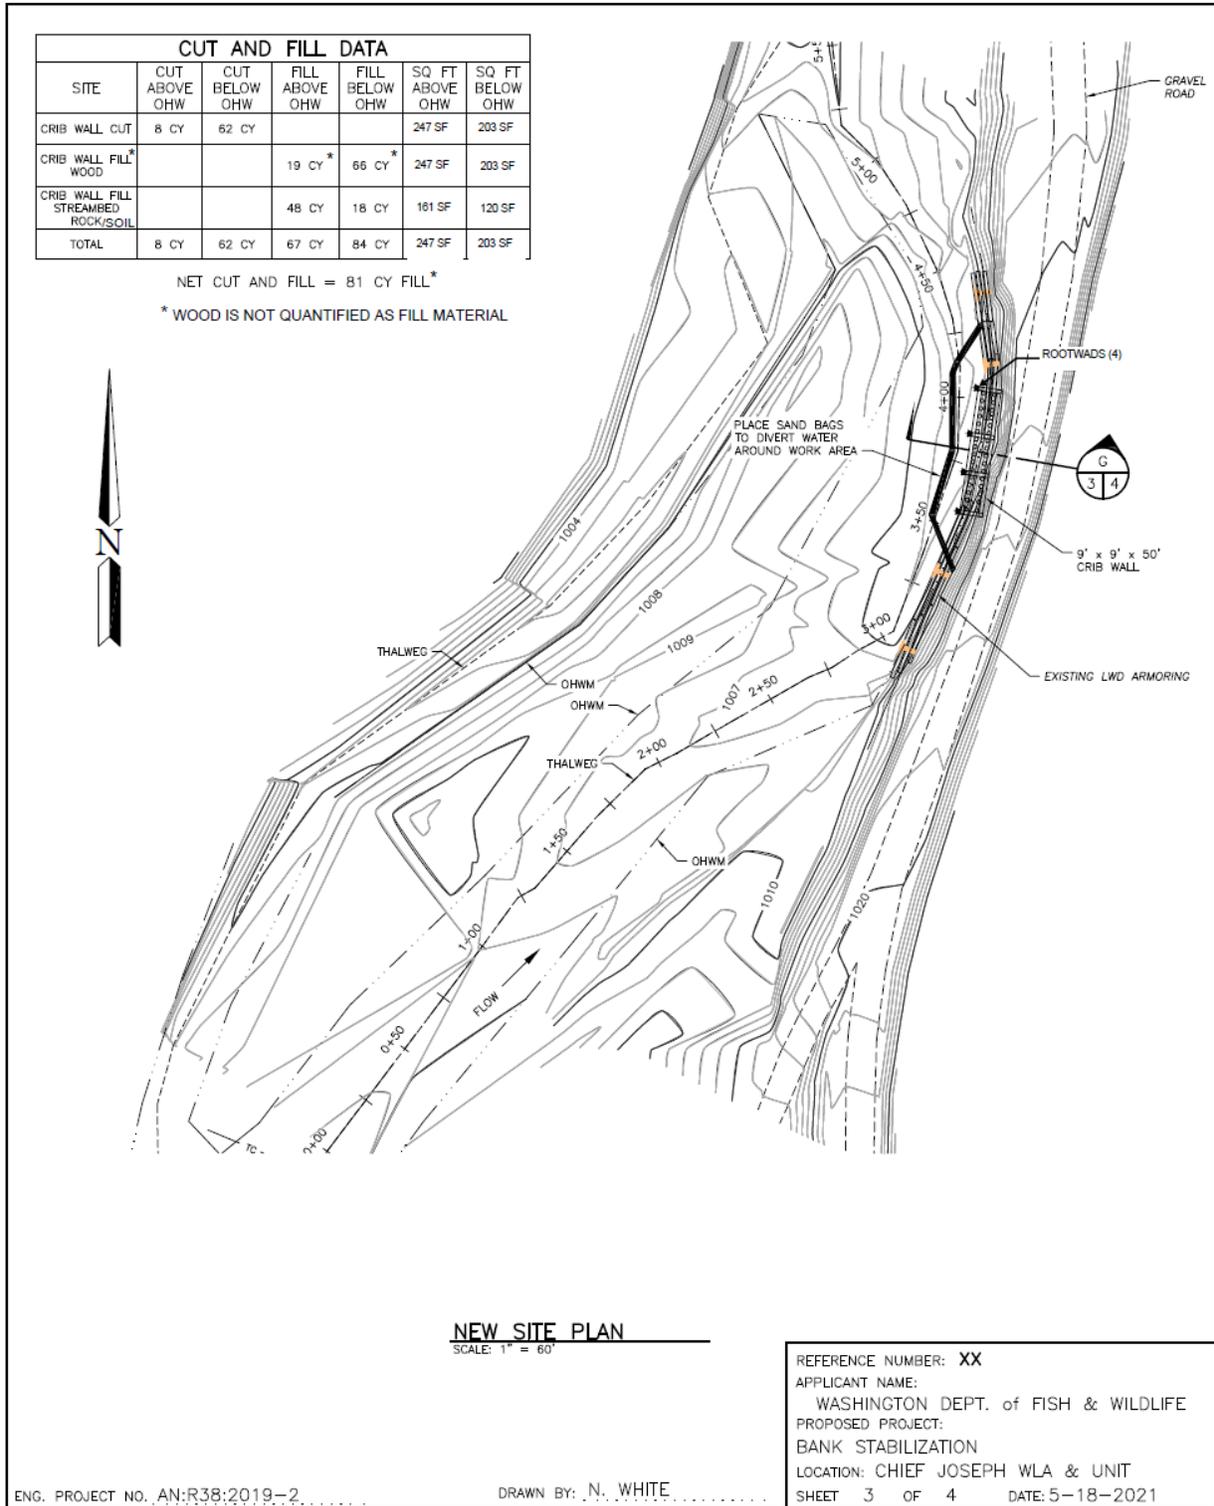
Plan view of the proposed crib wall structure within the Joseph Creek stream channel, Asotin County, WA.
